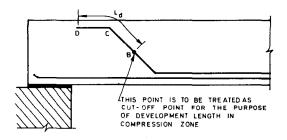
Anchoring Inclined Bent-Up Bar in Compression Zone
